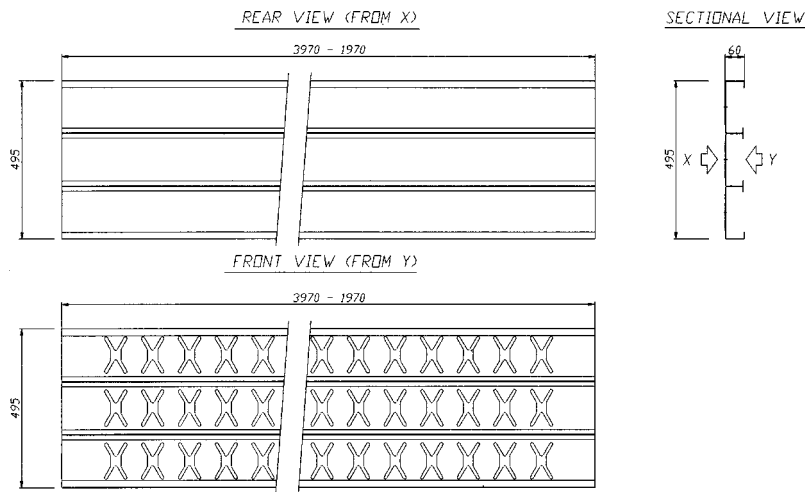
Barrier MET4: front, rear, and sectional view of the sample for outdoor measurements. Dimensions in millimeters.
